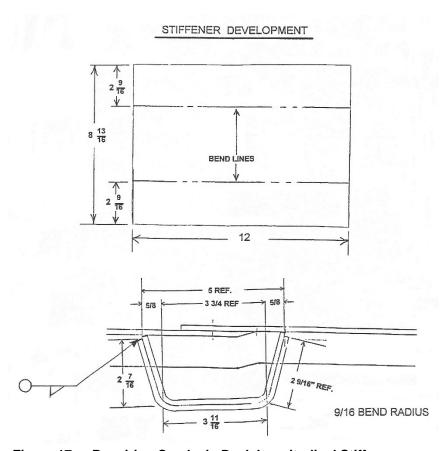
Repairing Cracks in Deck Longitudinal Stiffeners
